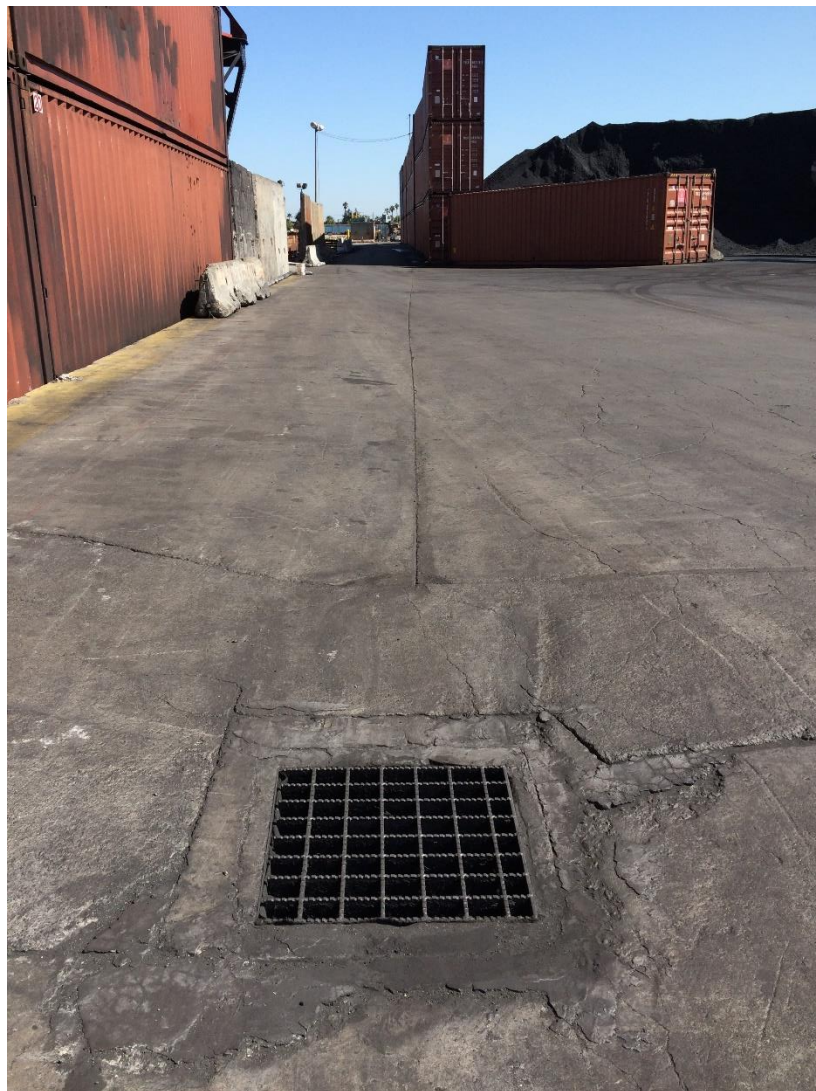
Looking north from drain inlet 3DI-10, along western alley of secondary storage area: surficial cracking and concrete seams in SW-3 area, with sealed crack in foreground.
